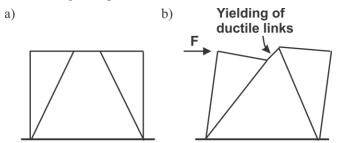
Eccentrically braced frame (EBF) system: a) Typical configuration; b) Intended yielding mechanism.
